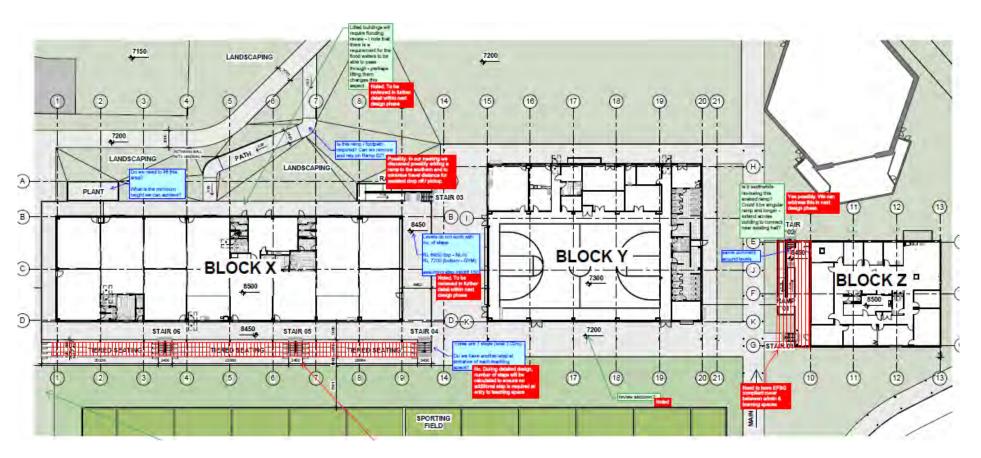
Detailed Site Plan (Extract from Drawing A-0-600 of the proposed Site plan (reference: Building Height Exercise - Option B (SINSW_RCC Review).pdf)
